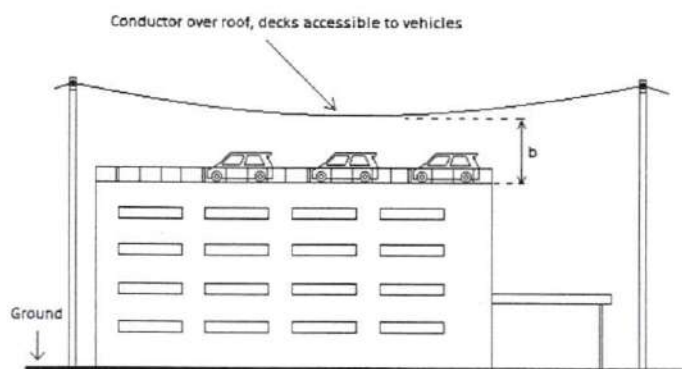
(3) Over roofs, ramps, decks, and loading docks accessible to vehicles but not subject to truck traffic
